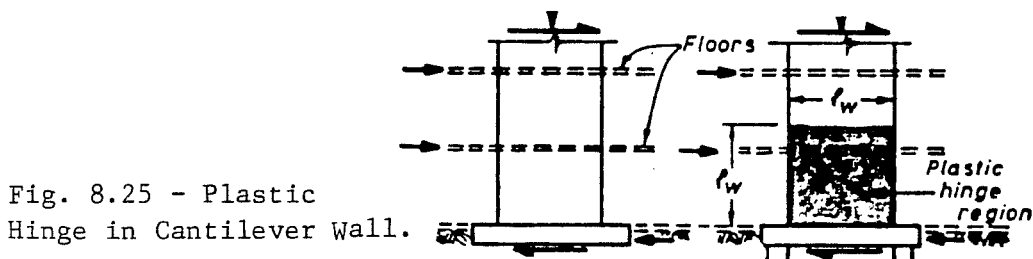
Plastic Hinge in Cantilever Wall.
